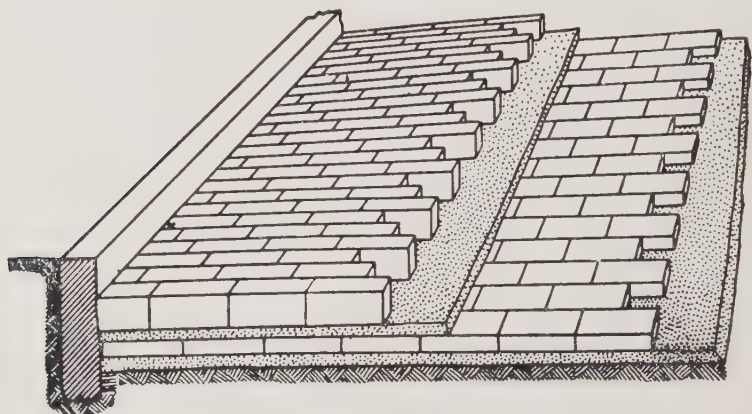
Section of a brick pavement with brick foundation. By courtesy of I. O. Baker.
